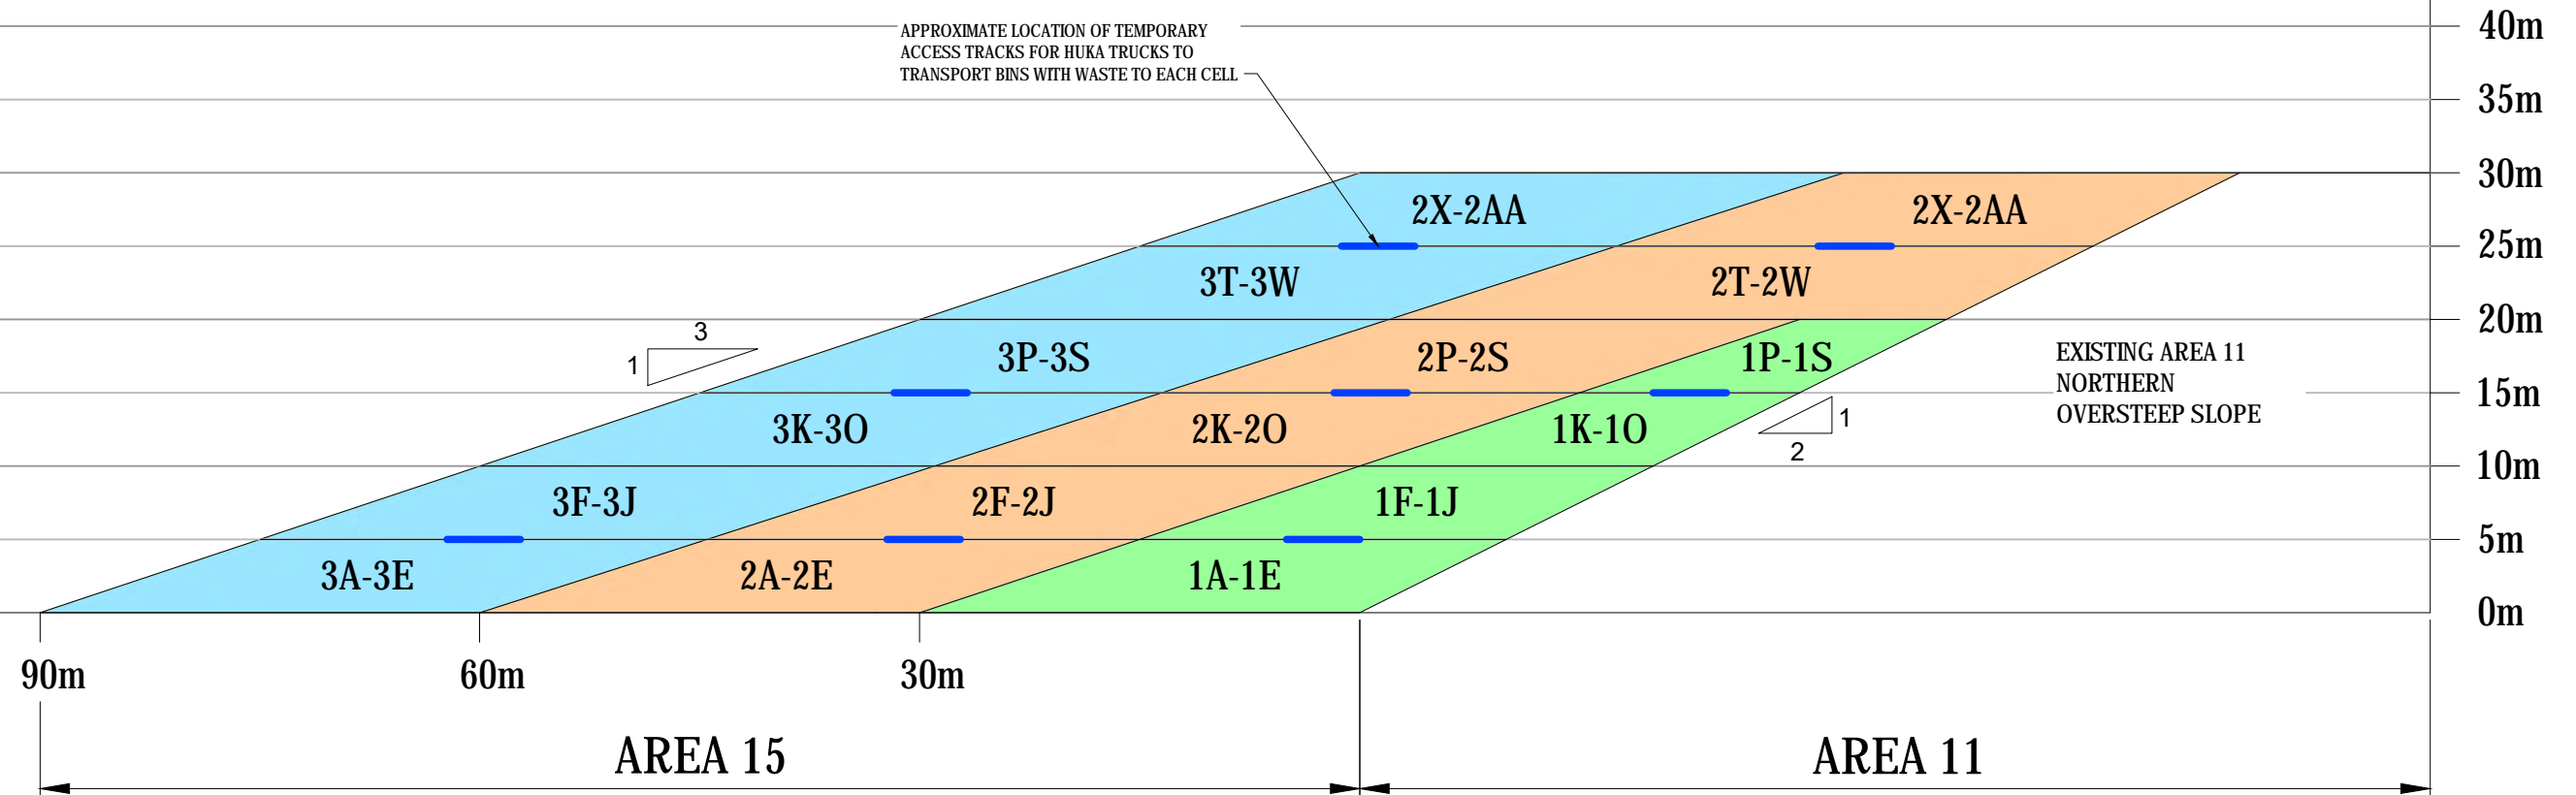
Phase 3 – Concept Filling Plan for Area 15
